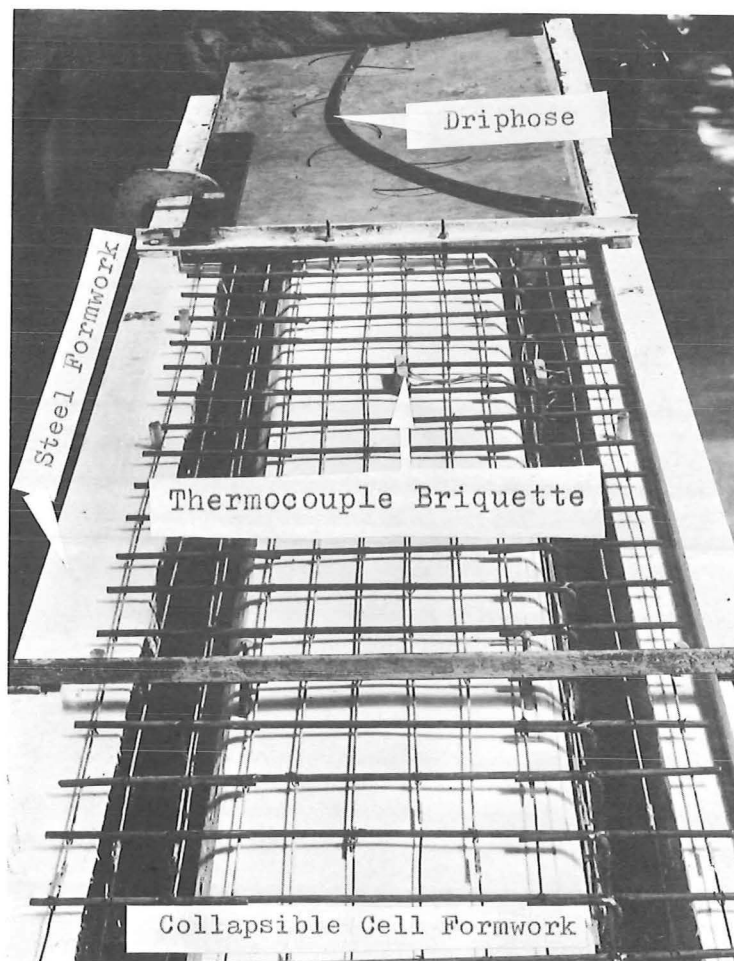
FORMWORK FOR CASTING TOP PORTION OF BEAM THREE
